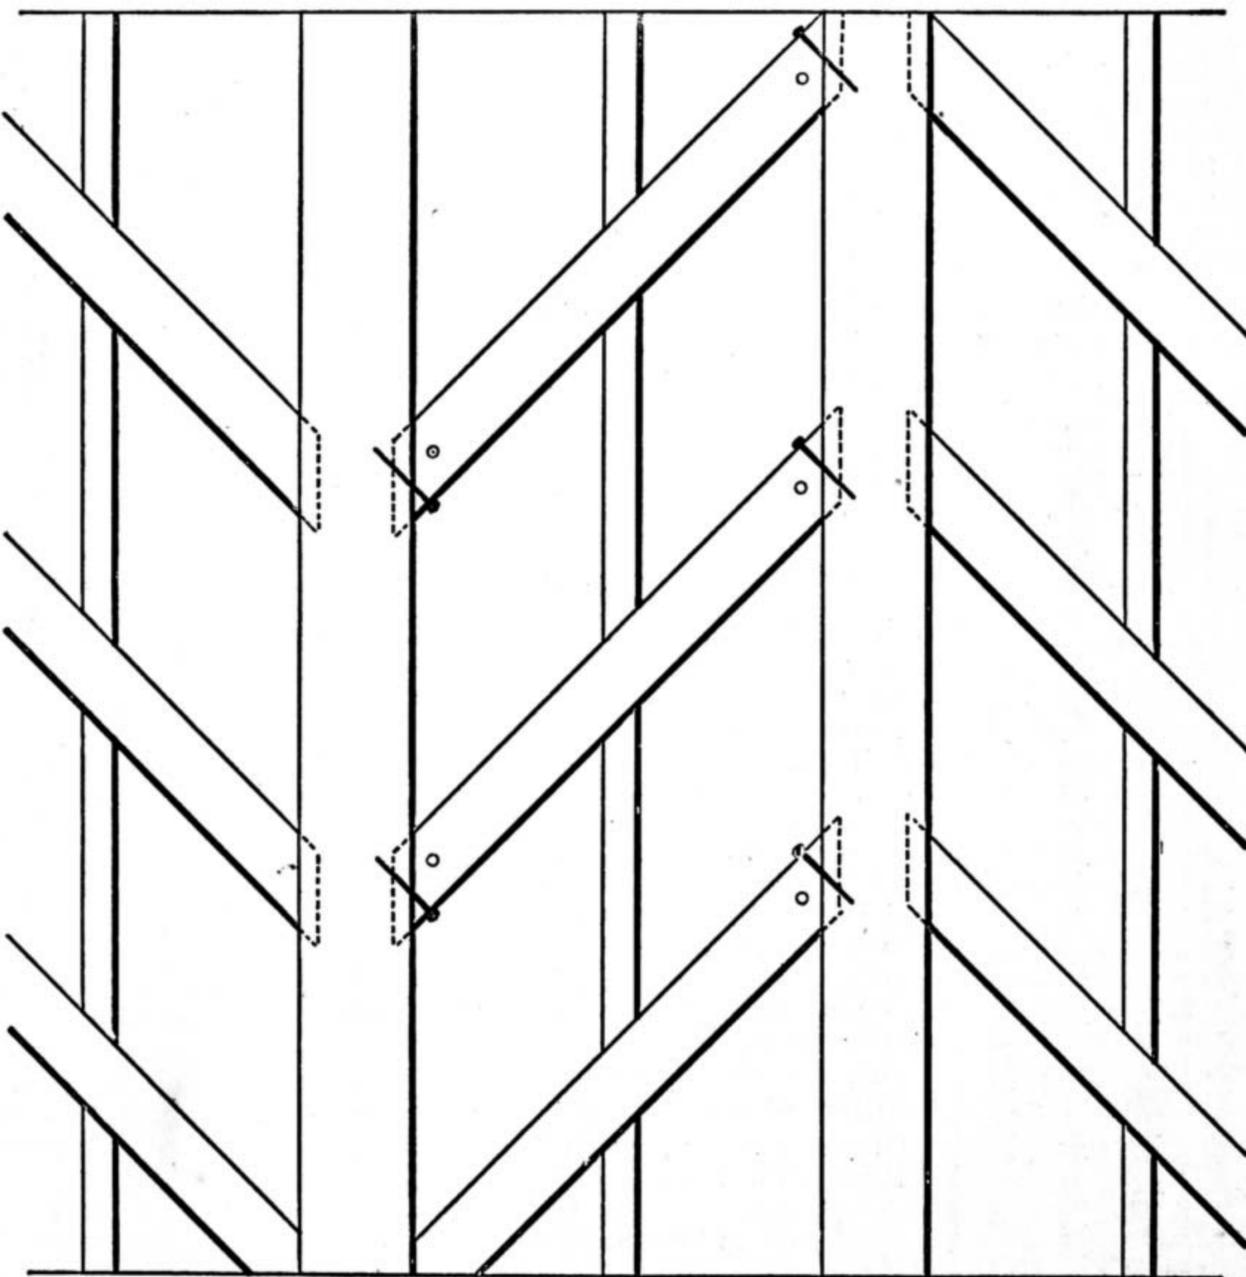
Wood Ceiling. Plan, showing Alternative Arrangement for Support of Veneering.
